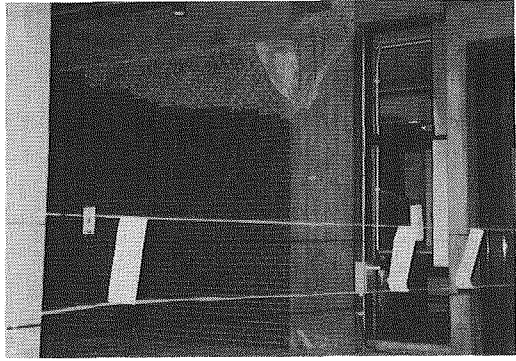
Damage to a column and wall panel at the entrance. The wall had been installed after 1968 Tokachi-oki Earthquake.
